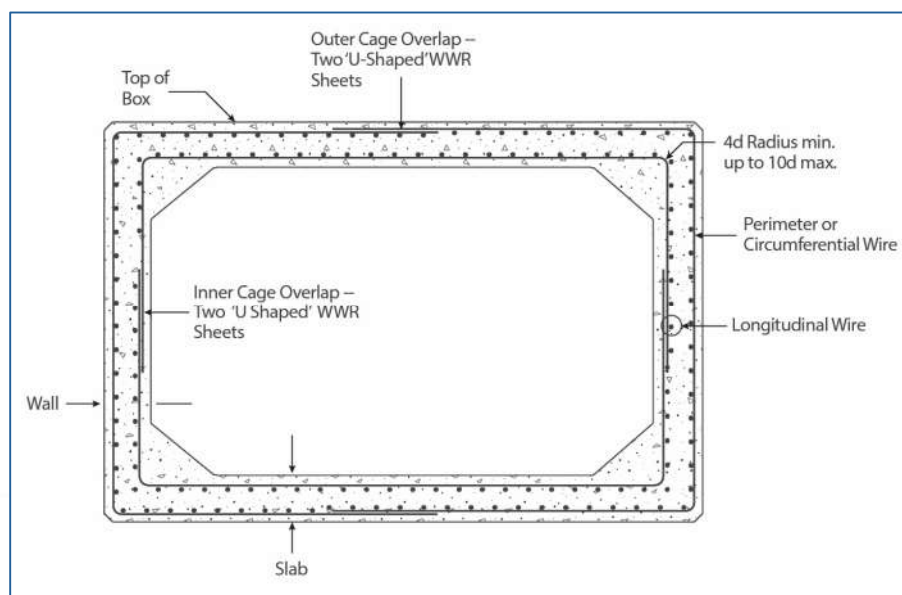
Reinforced Precast Concrete Box Section - Typical Arrangement of WWR
